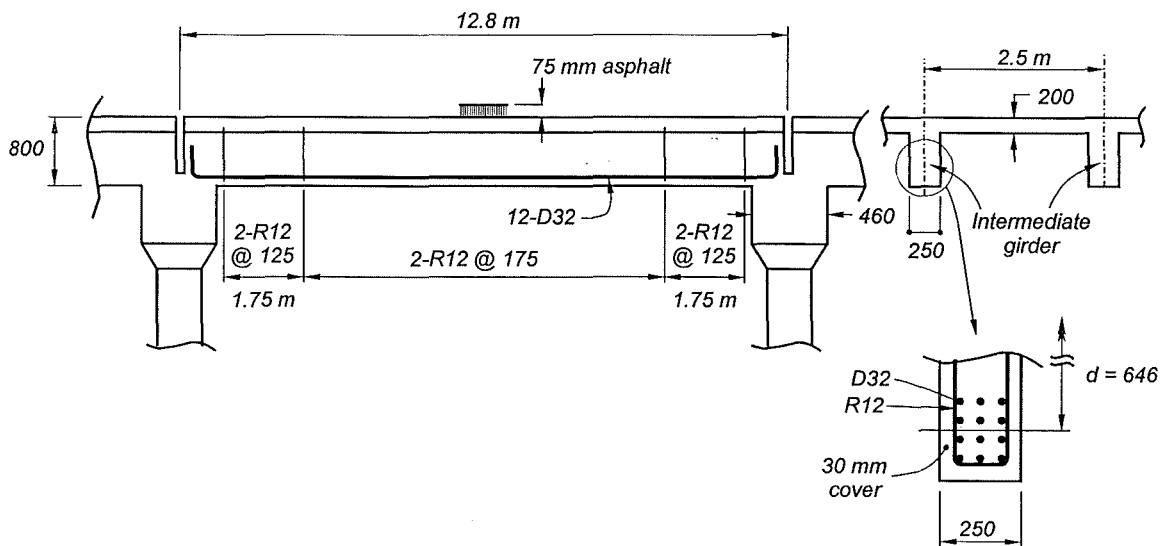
General Reinforcing Details of the Two Lane Bridge
